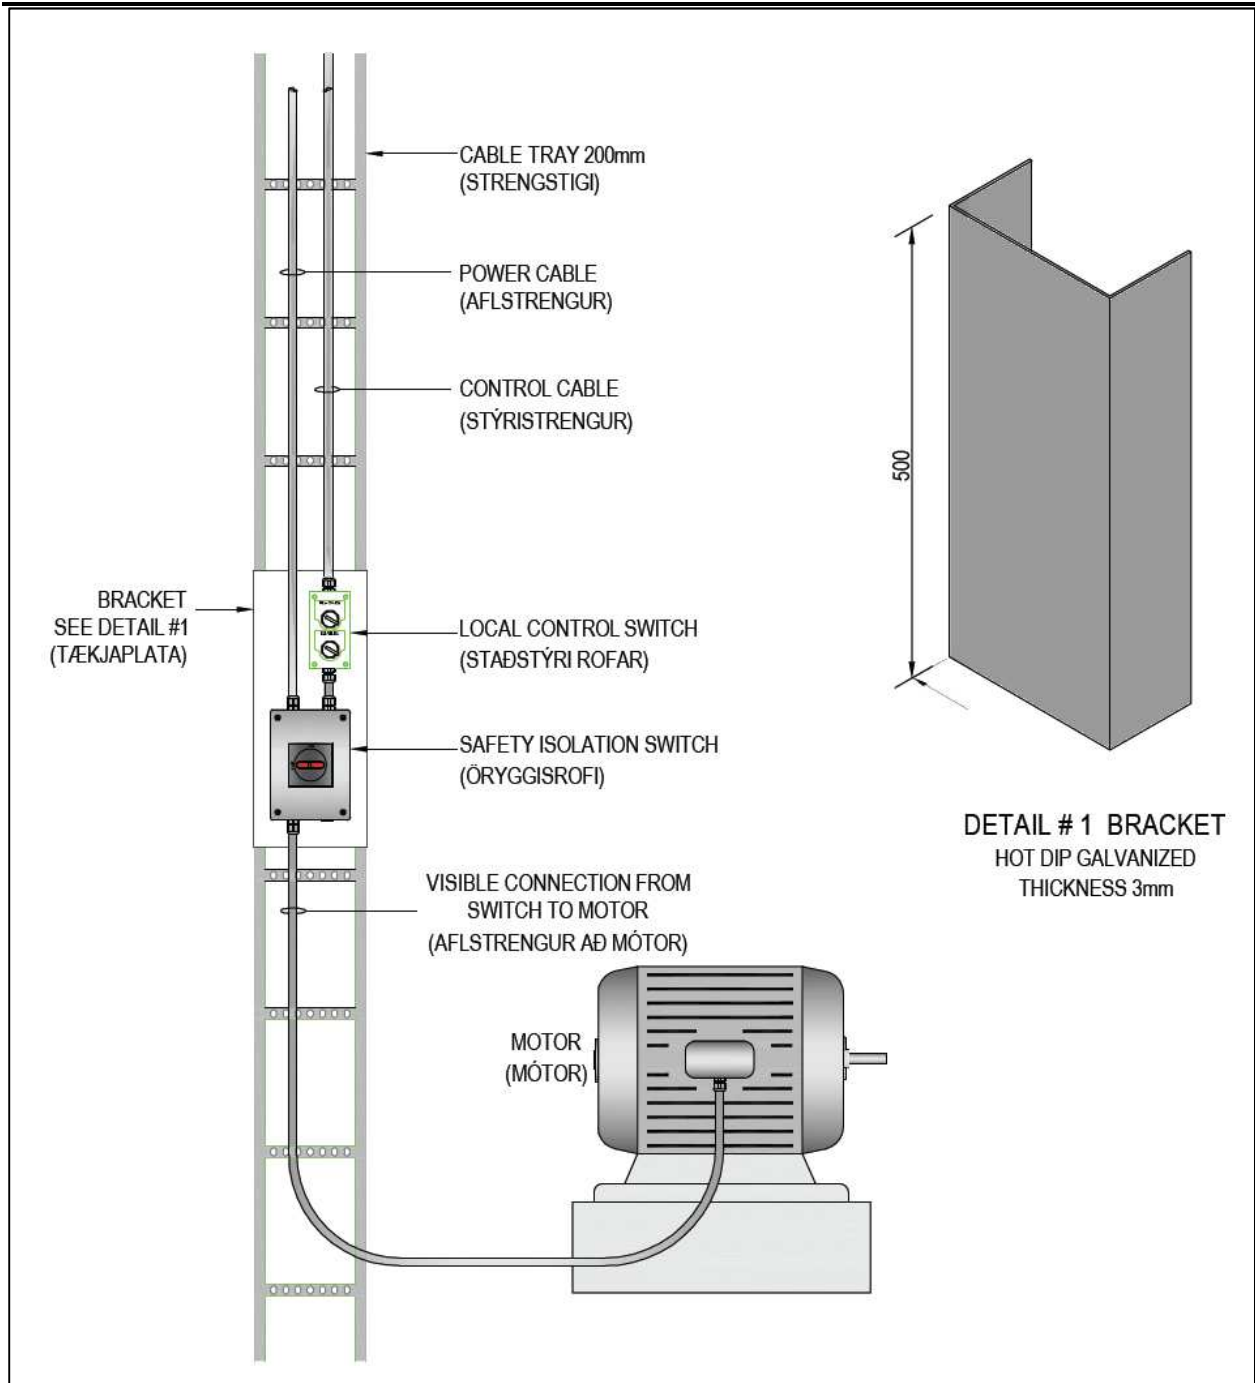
The safety isolation switch is installed on a standard size bracket next to the equipment, e.g. according to this typical arrangement figure.
